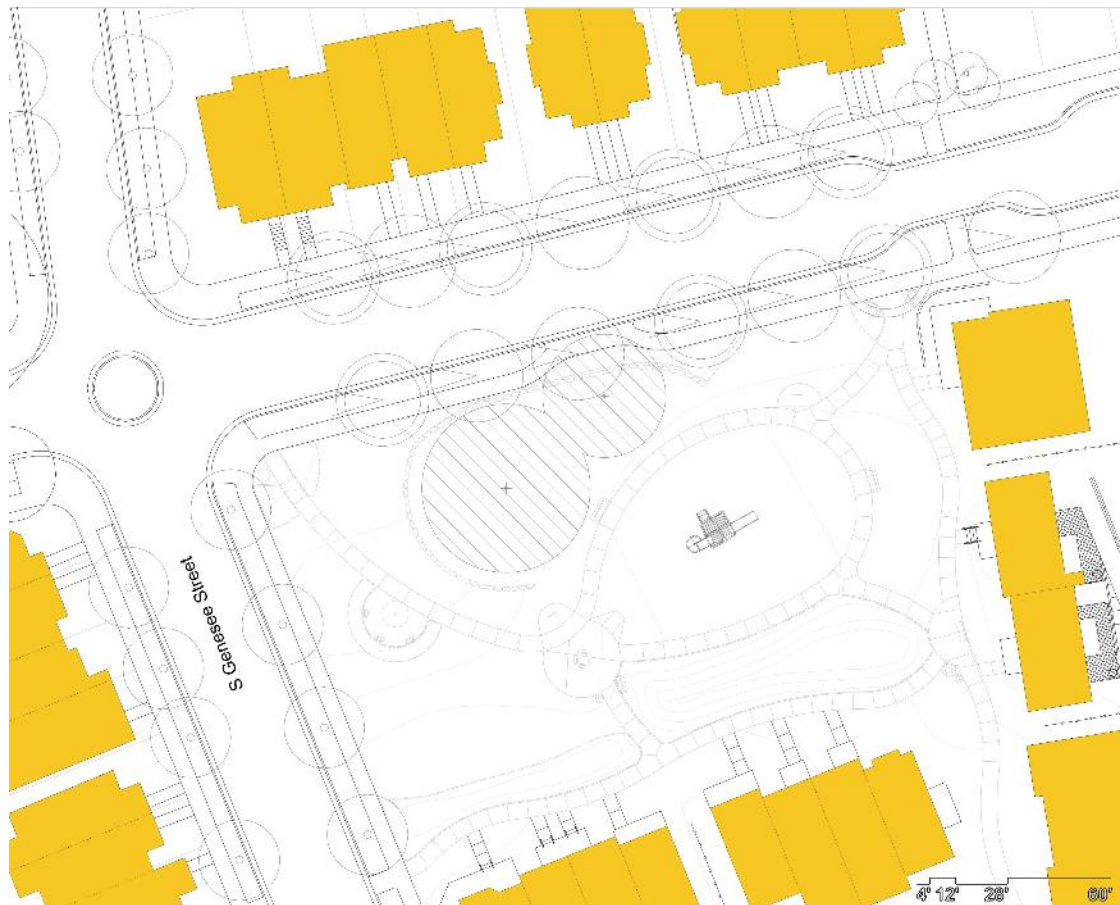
Genesee Park site plan. North facing left of page.²⁷
